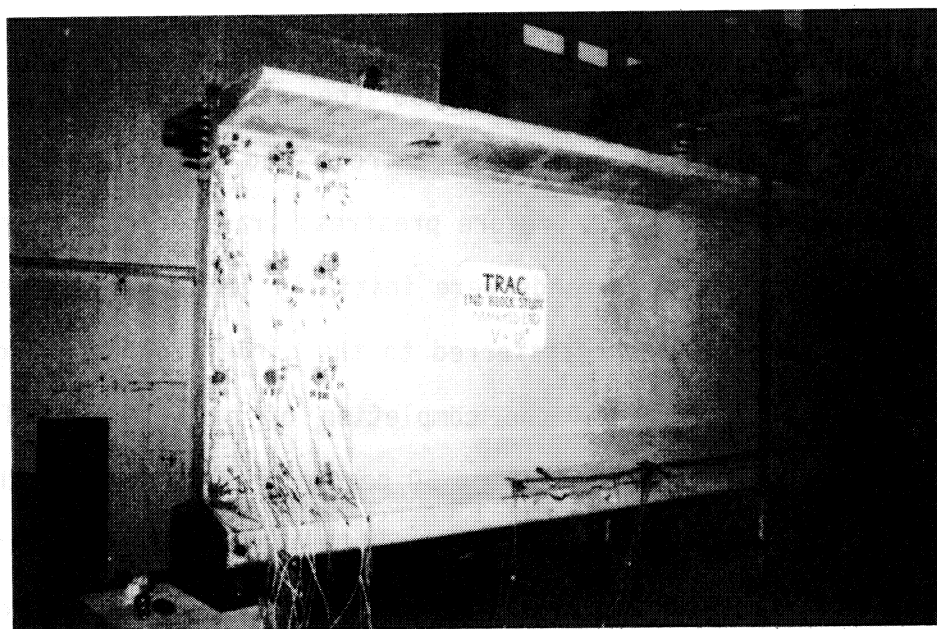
Cracking of unmarked end due to prestress transfer (cracks are outlined with black ink).
